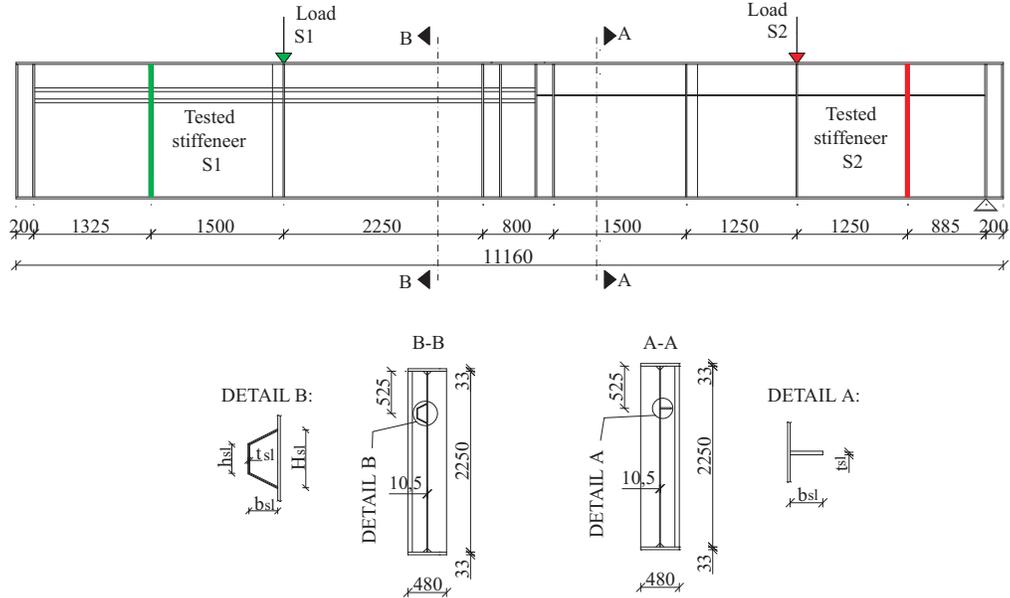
Layout of the tested girder and loading positions for tests S1 and S2
